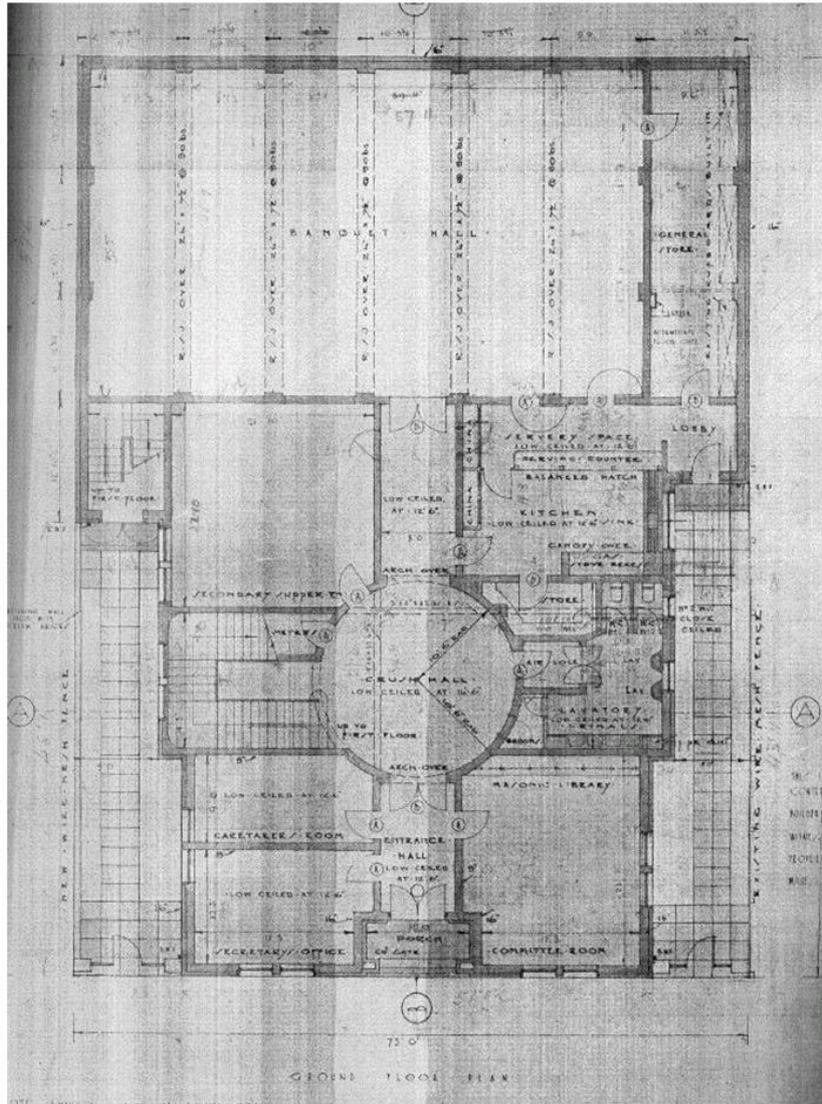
Ground floor plan of proposed Masonic Hall. Tasmanian Archive and Heritage Office AE417/1
